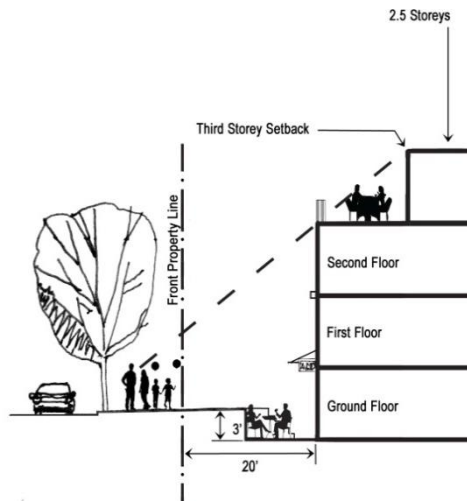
Illustration of upper floor setback for flat or shallow pitched roofs
